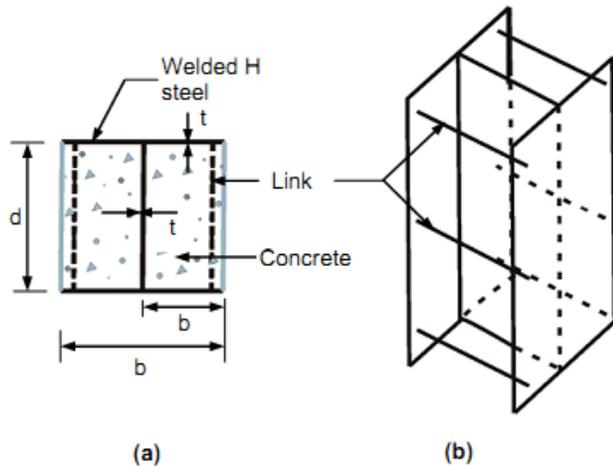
Partially encased composite column , (a) Column Cross-Section and (b) 3D view of the Steel Configuration
